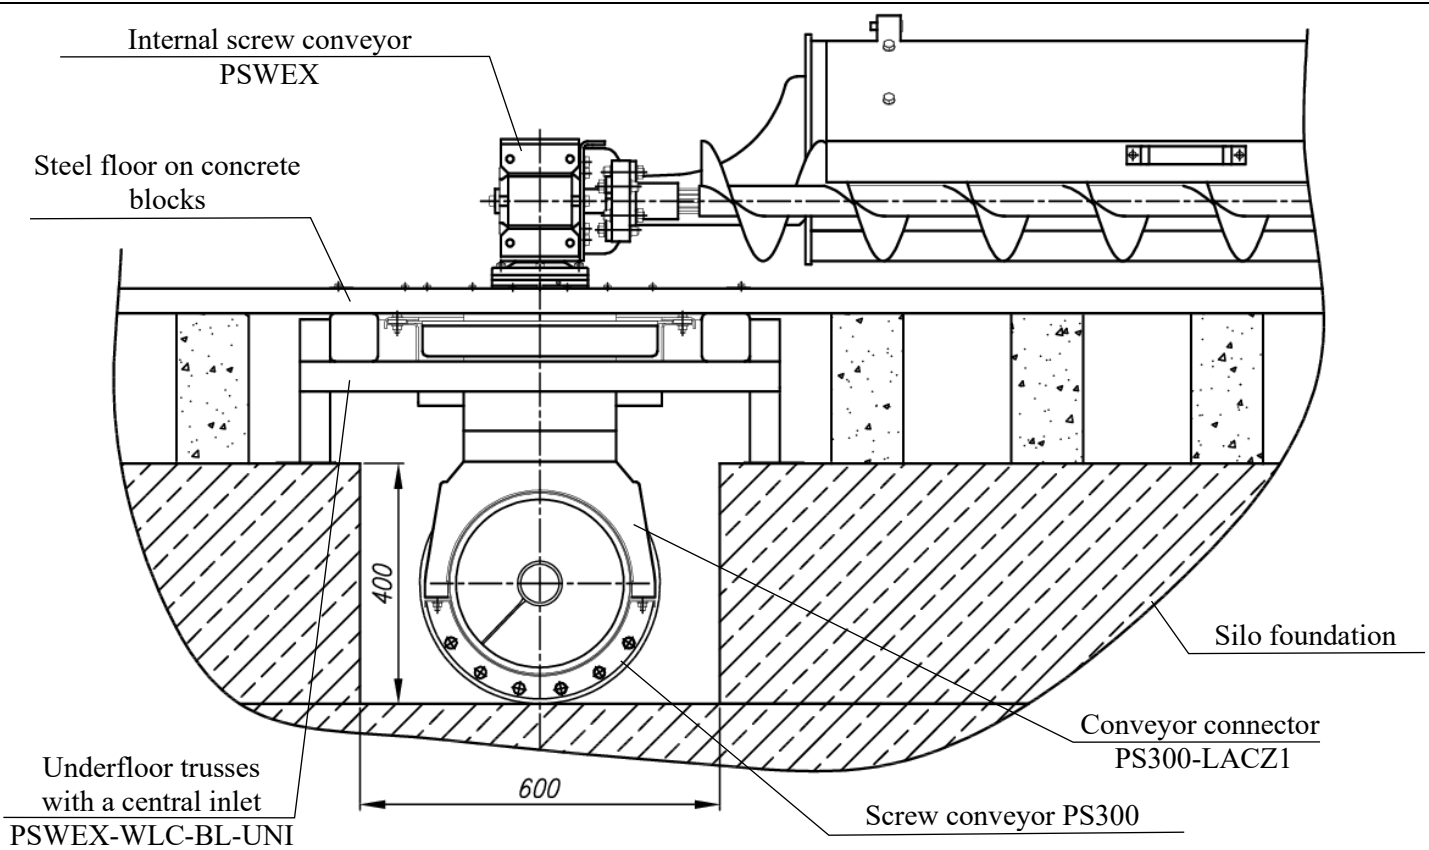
A method for connecting the PS300 conveyor with PSWEX using the connector PS300-LACZ1, a steel floor on concrete blocks, and underfloor trusses with the central inlet PSWEX-WLC-BL-UNI.
